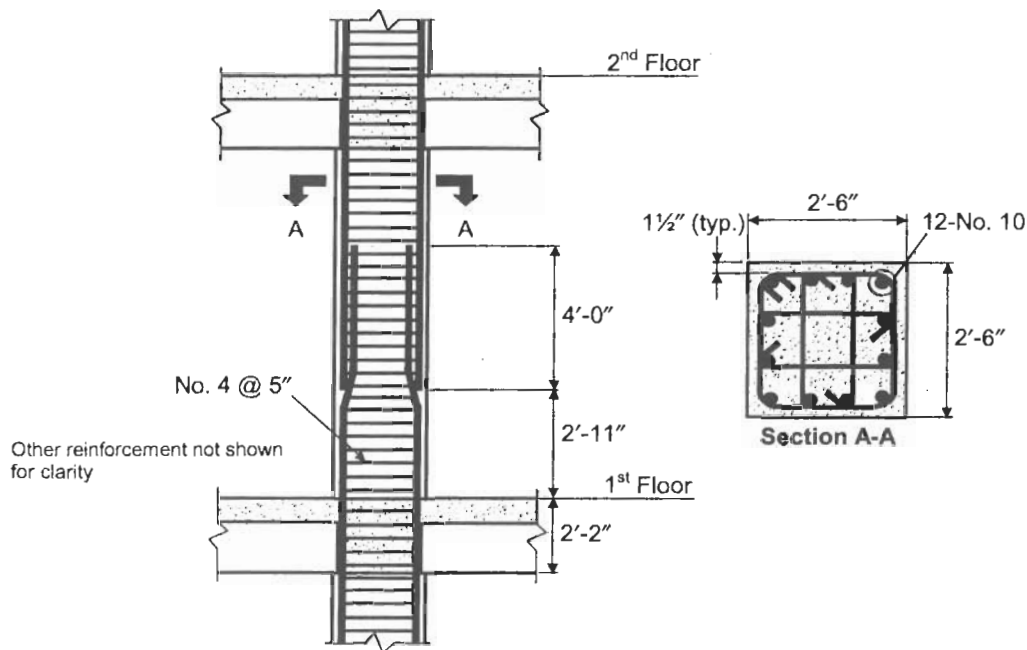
Reinforcement Details for Column C4 Supporting the 2<sup>nd</sup> Floor Level (SDC D)
